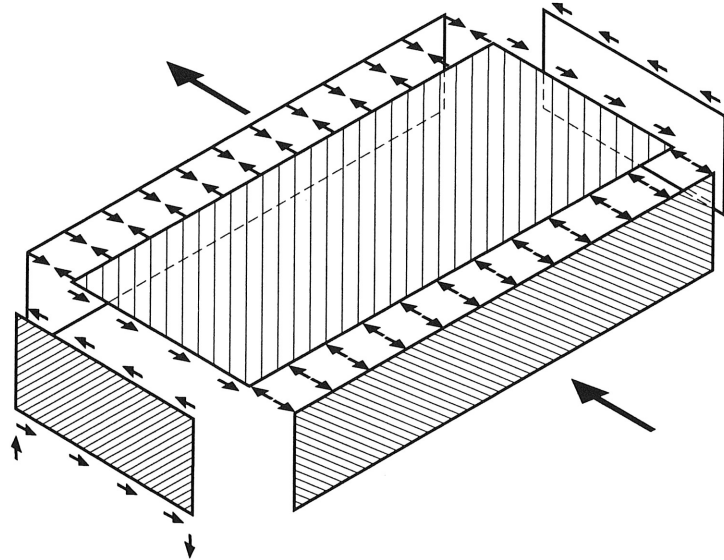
External wind loads for wind direction perpendicular to the long side wall. The arrow shows the wind direction.
